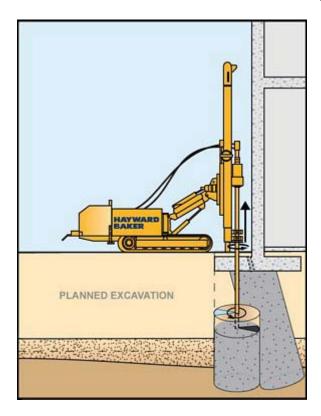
Installation of a soilcrete column using jet-grouting (Hayward Baker, 2014).
